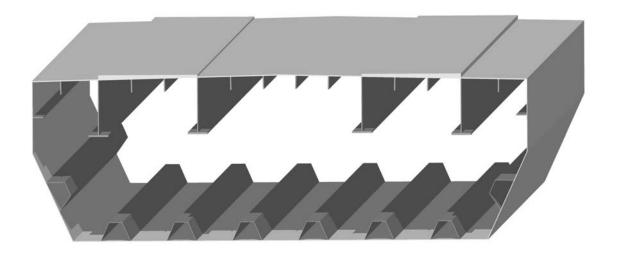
Typical cross-section of the suspended deck (rail way).
